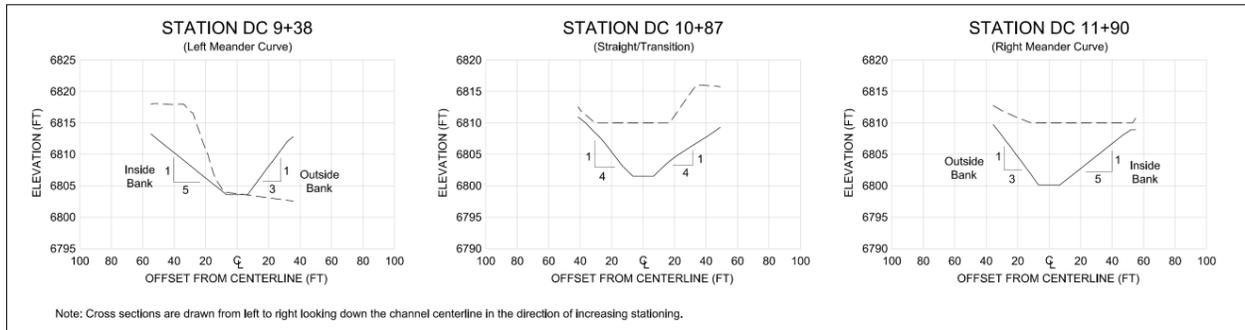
Excerpt from plan set illustrating typical differential side slopes for channel cross sections.
